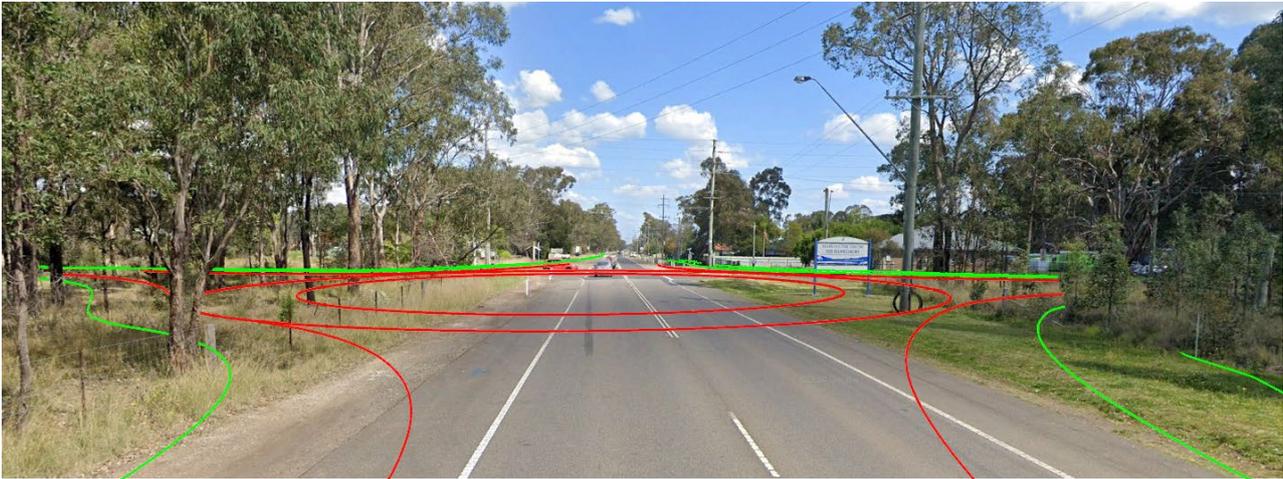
View of section to be developed through the new roundabout at Londonderry Road / The Driftway
